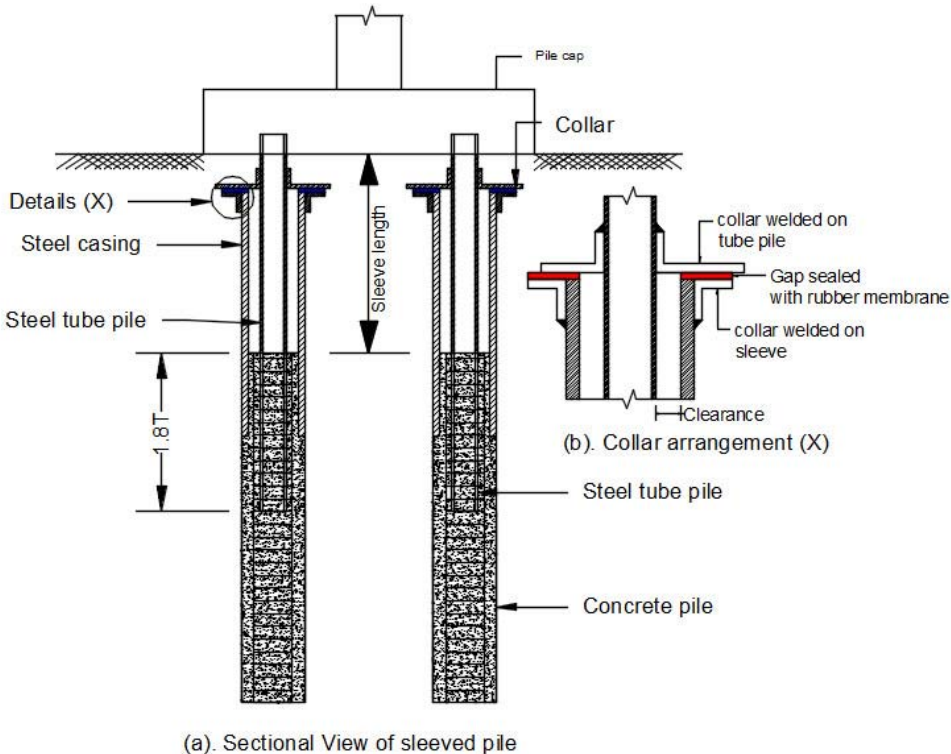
Proposed of arrangement of sleeved pile for bridge in the present study
